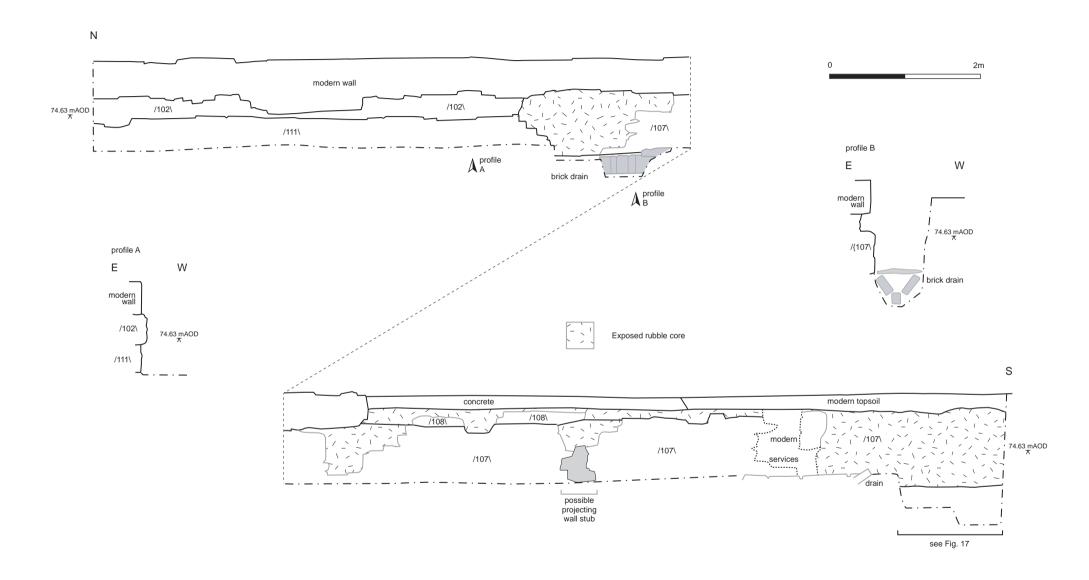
Elevations of walls /102\, /107\, /108\ and /111\, viewed from the west.
